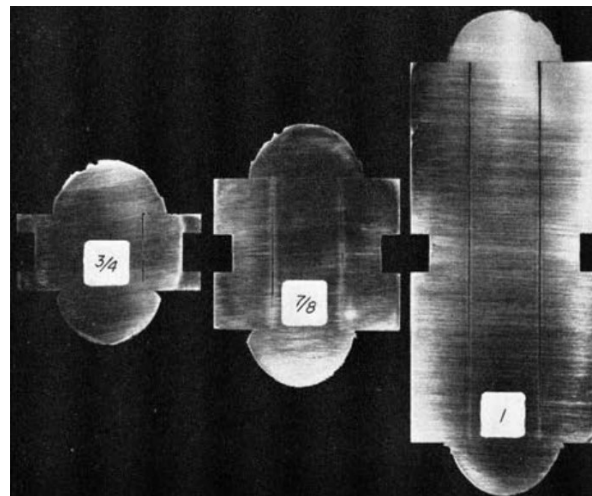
Sawed sections of hot-driven rivets with different grip length. An increasing clearance between rivet shank and holes can be observed for longer rivets (*Munse & Cox, 1956*).
